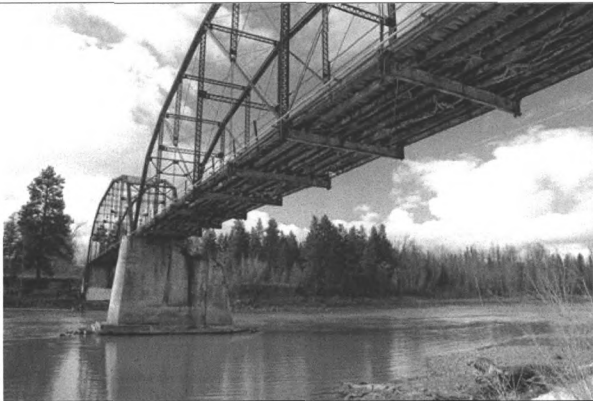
West elevation of the Flathead River bridge. View to the northeast.
